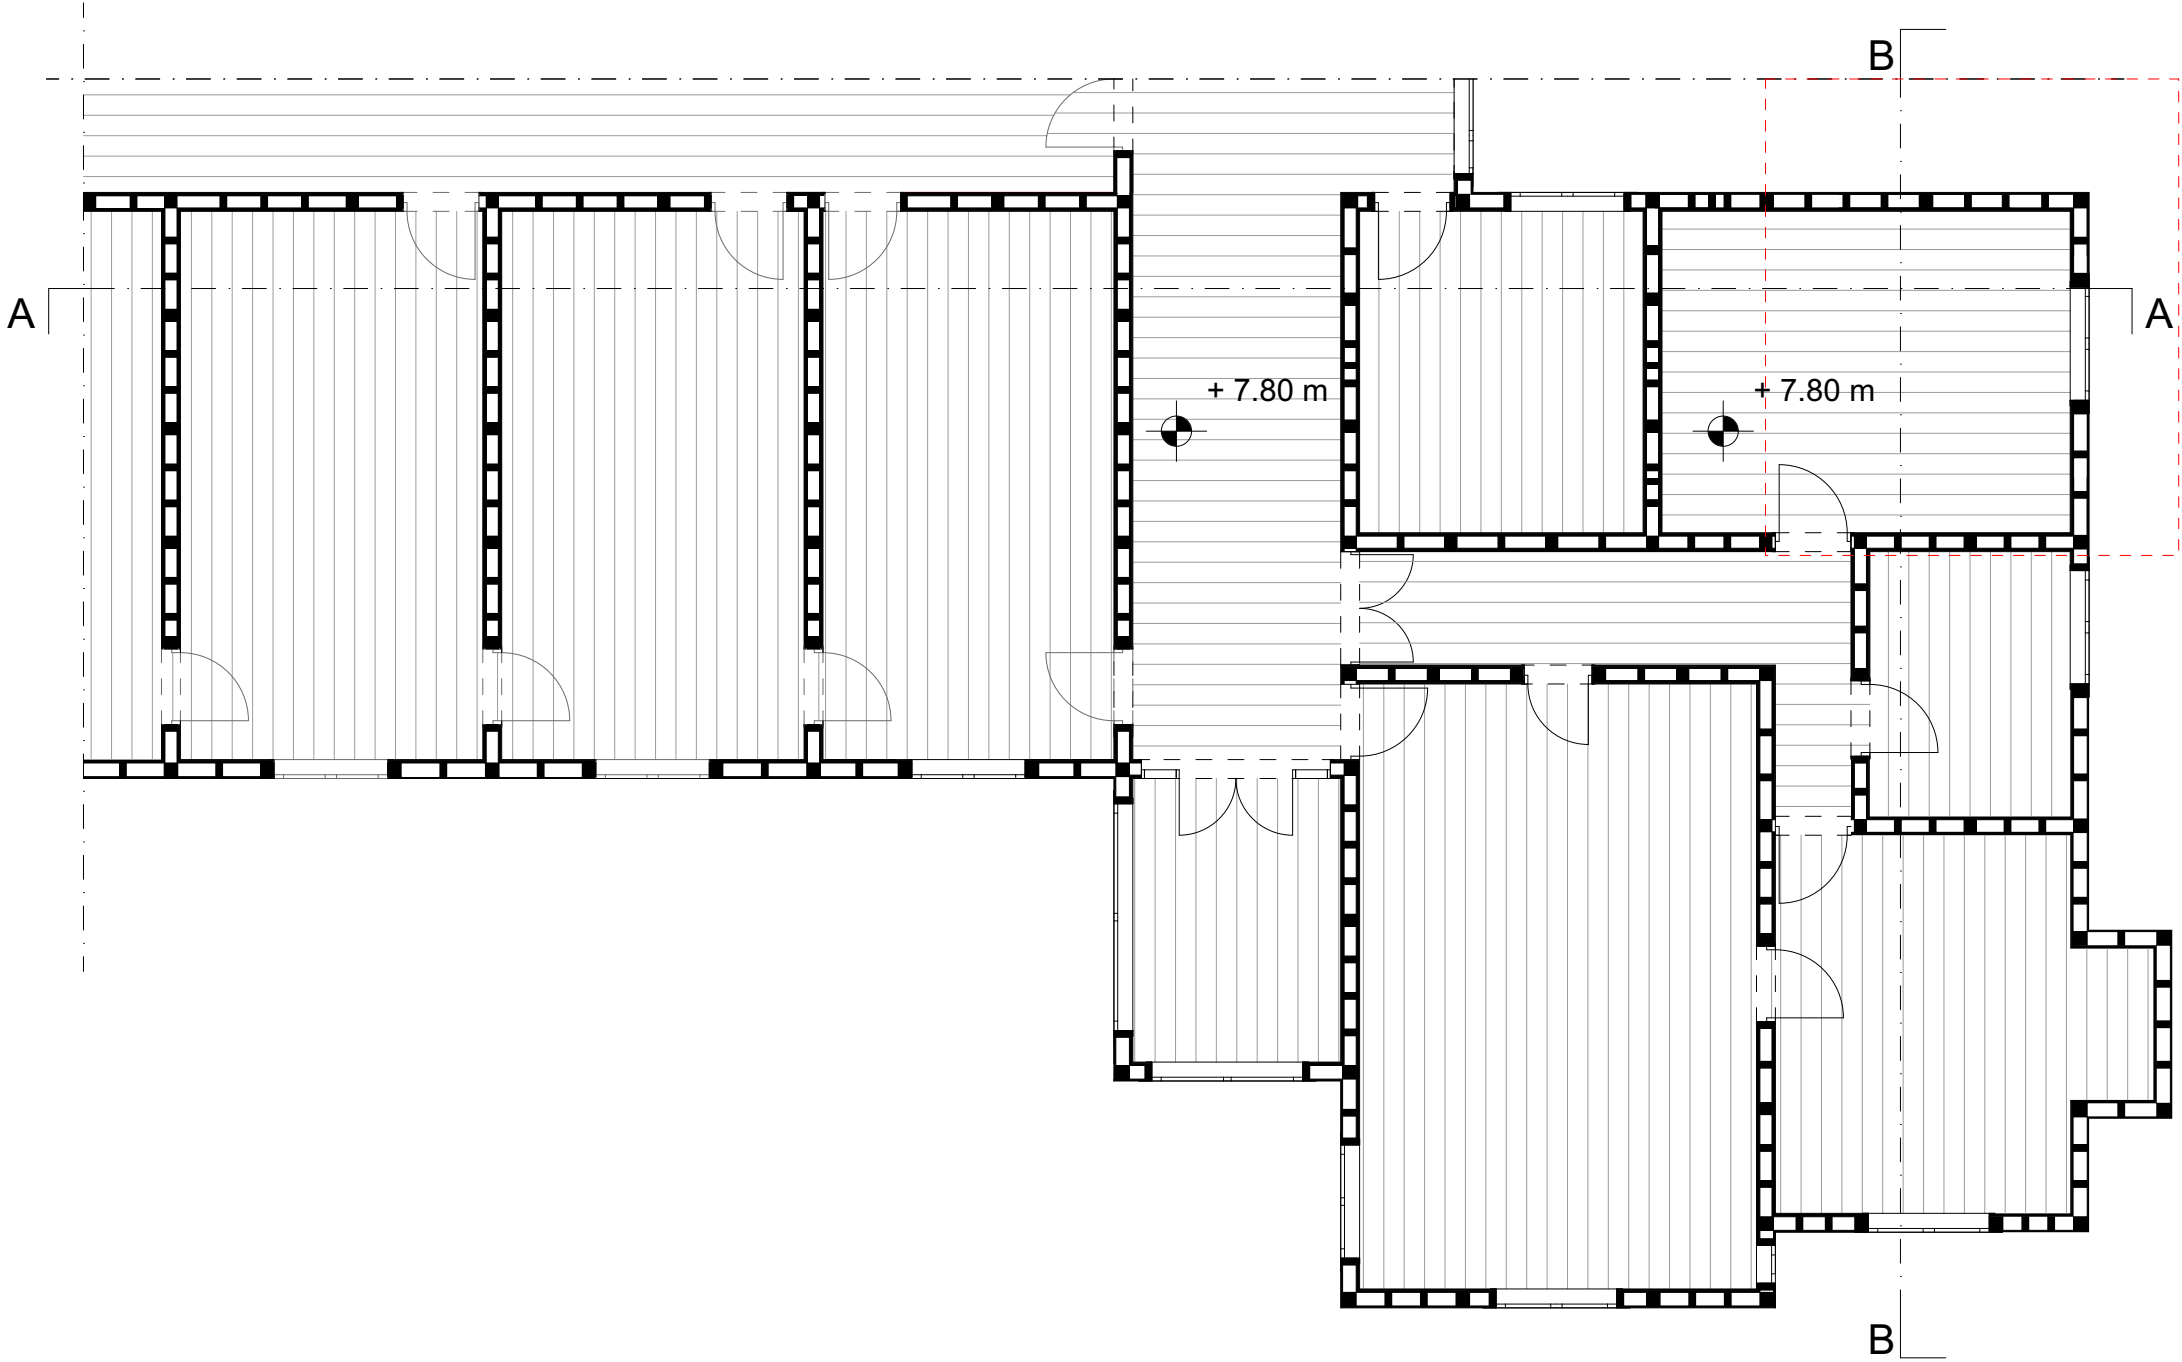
First Floor Plan (Source: Created by the author, 2024)
